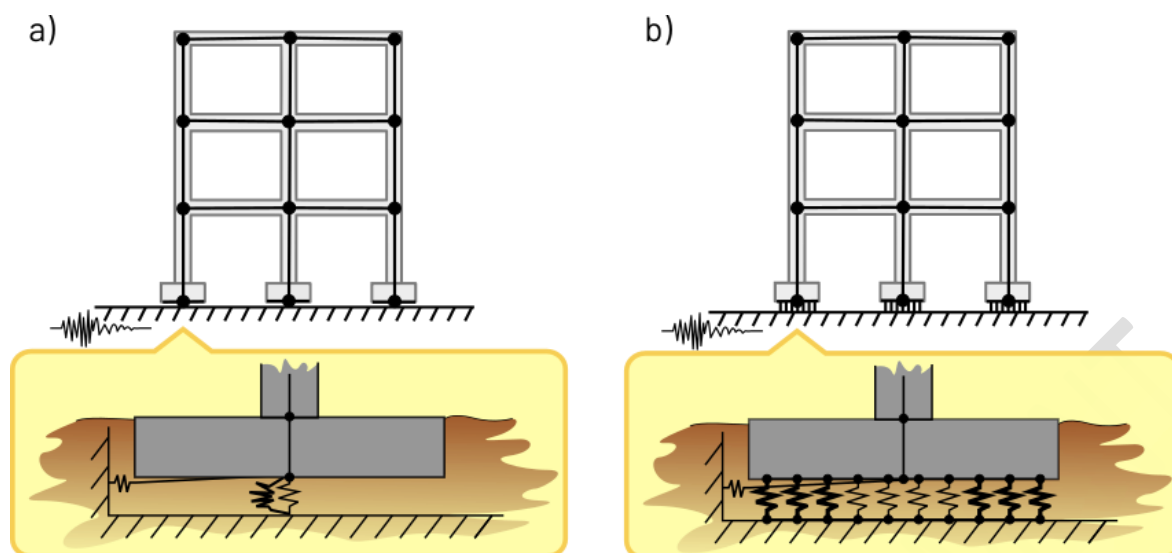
a) point springs foundation model, b) spring-bed (Winkler) foundation model
